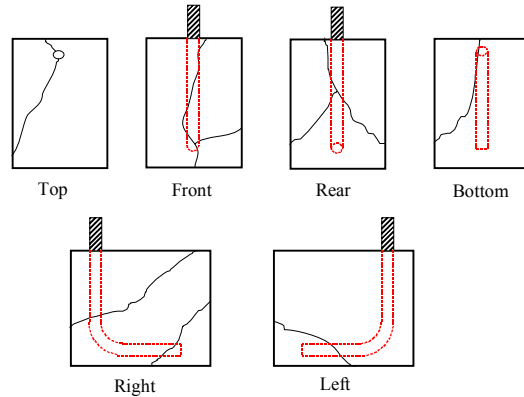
Drawing of typical crack pattern after concrete splitting failure. (MM\_7\_180\_35\_3)
